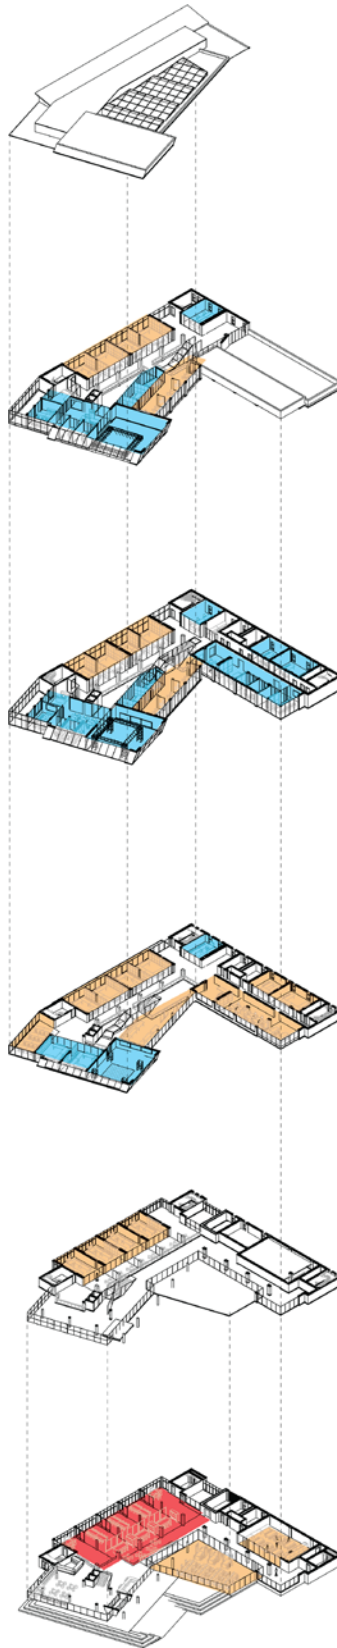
Exploded axonometric detailing floor plan arrangements (source: author)
